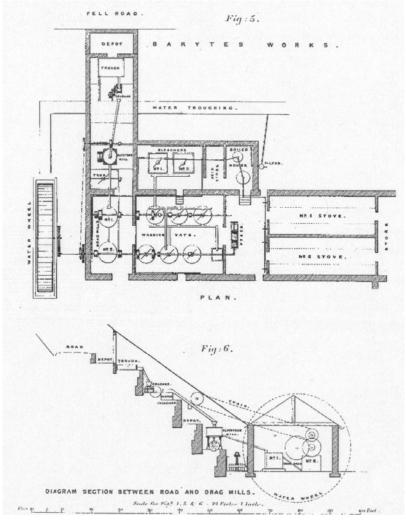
Plan and section of the barytes works (After Addison 1890, figs. 5 and 6)
